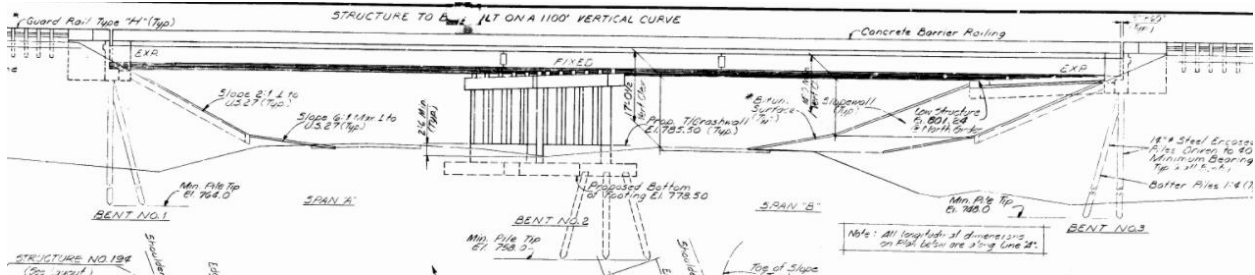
Elevation View of the Bridge (NBI 32841) (1981)
